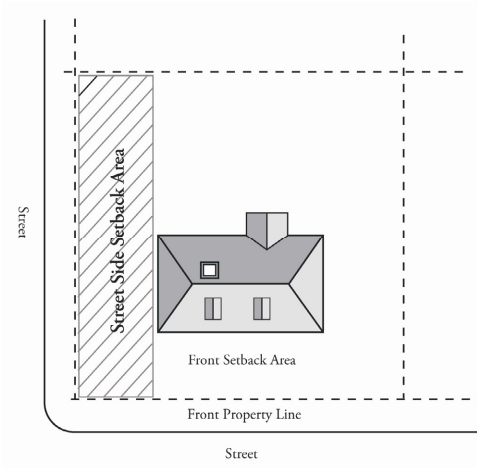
STREET SIDE SETBACK AREA
